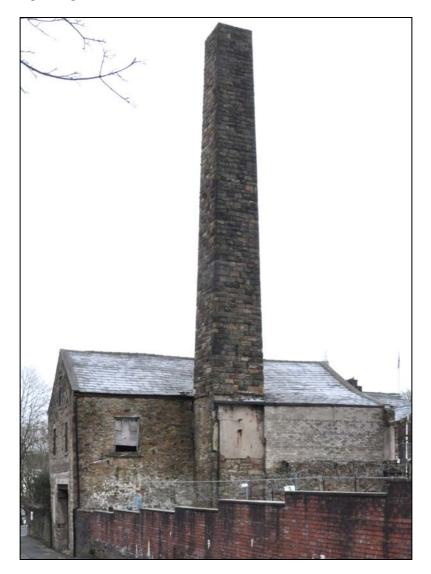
Building 2 – general view from the west, across Mount Pleasant Street
